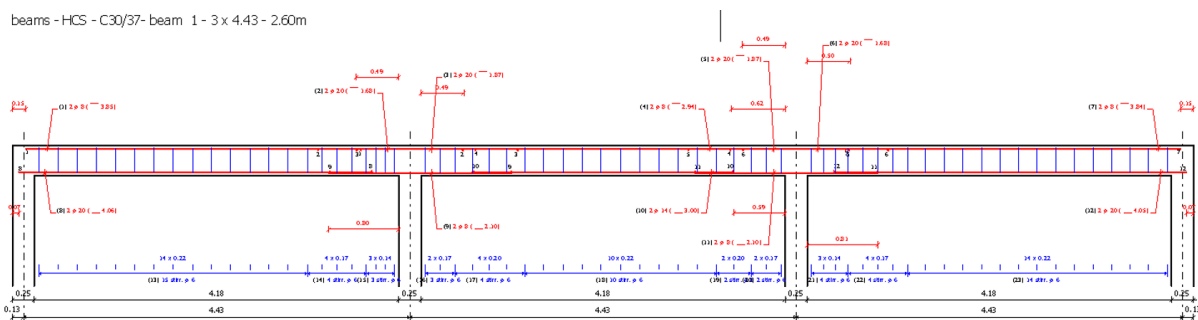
Practical reinforcement distribution concrete beam 1 - L01 - C30/37
